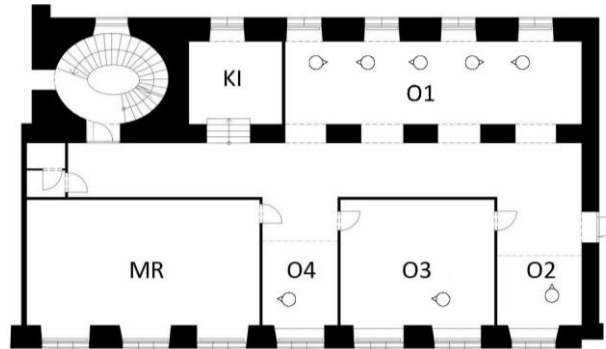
Floor plan of open plan office area (Mahdavi et al. 2019)
